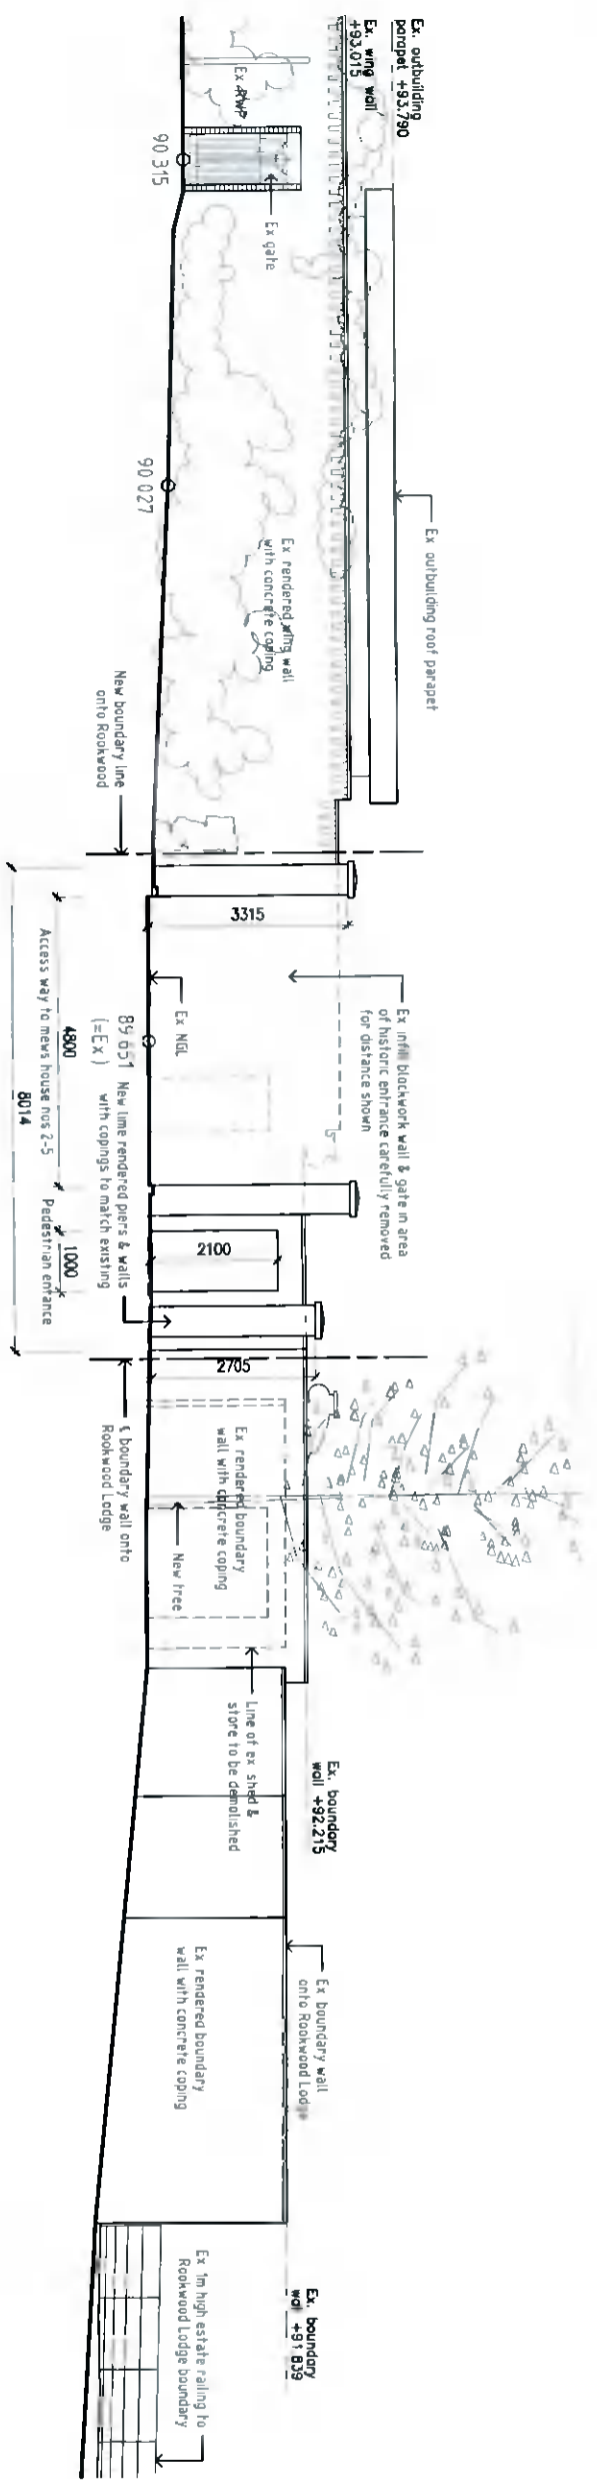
North Elevation - Flanking wall - new opening formed in wall
